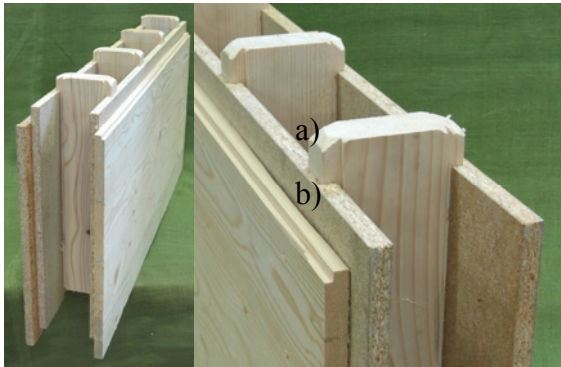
Prefabricated Timber Wall Element (left); Offset of columns (a) offset of layers (b) (right)
